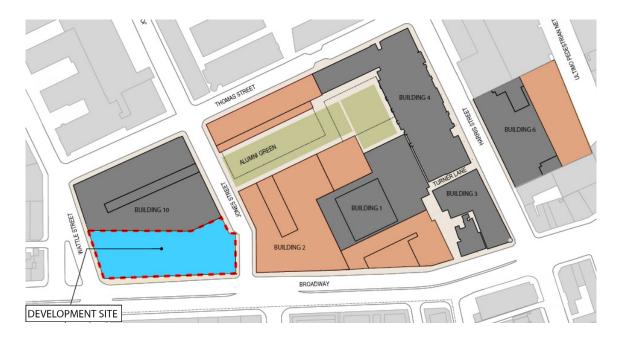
UTS Broadway Precinct and the Broadway Building site (FIX)
